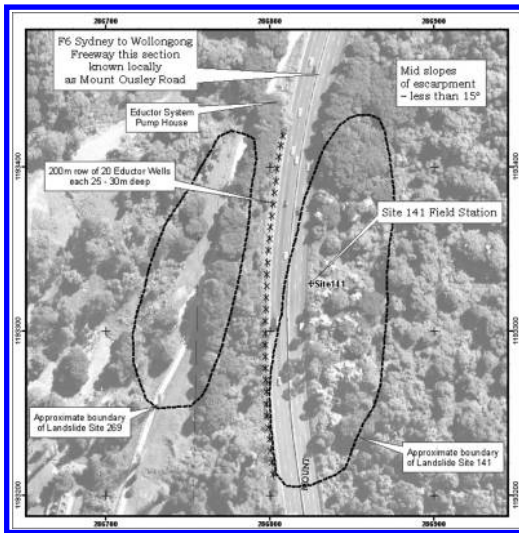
Site 141 on Mount Ousley Road (see Fig. 1).
